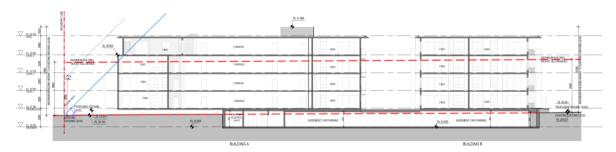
Sections for Building A and B (Source: Group GSA Architects)
